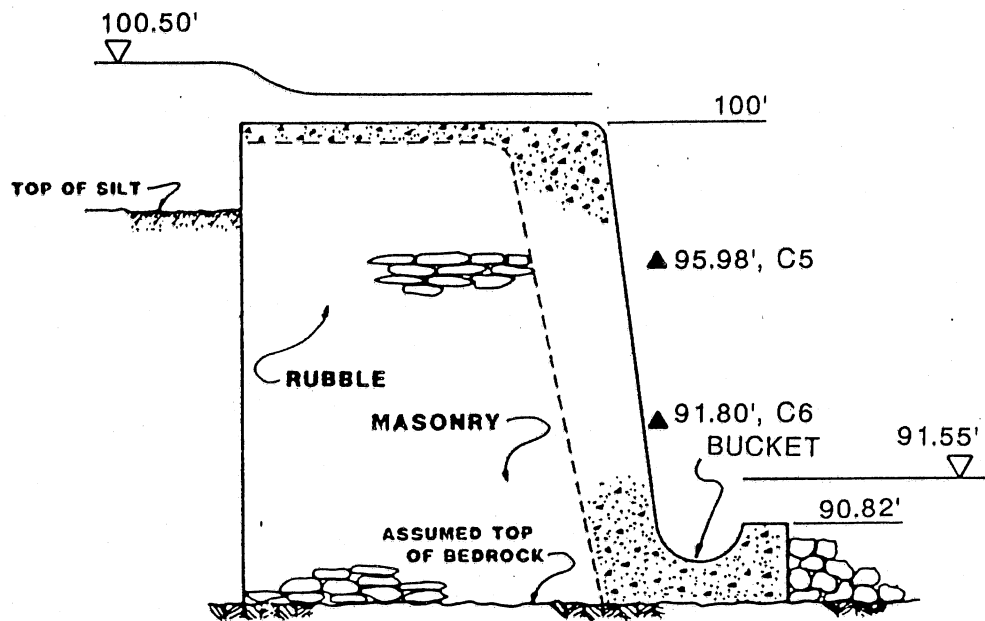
Spillway cross section showing December 17, 1985, spillway sampling locations.
